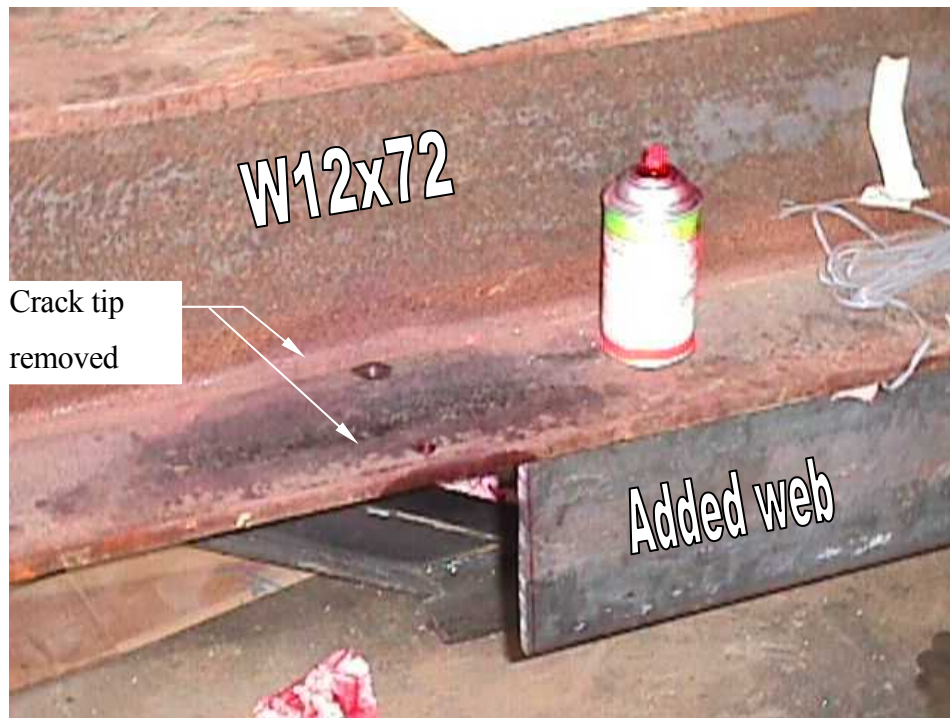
Drilled out crack tips in beam flange.
